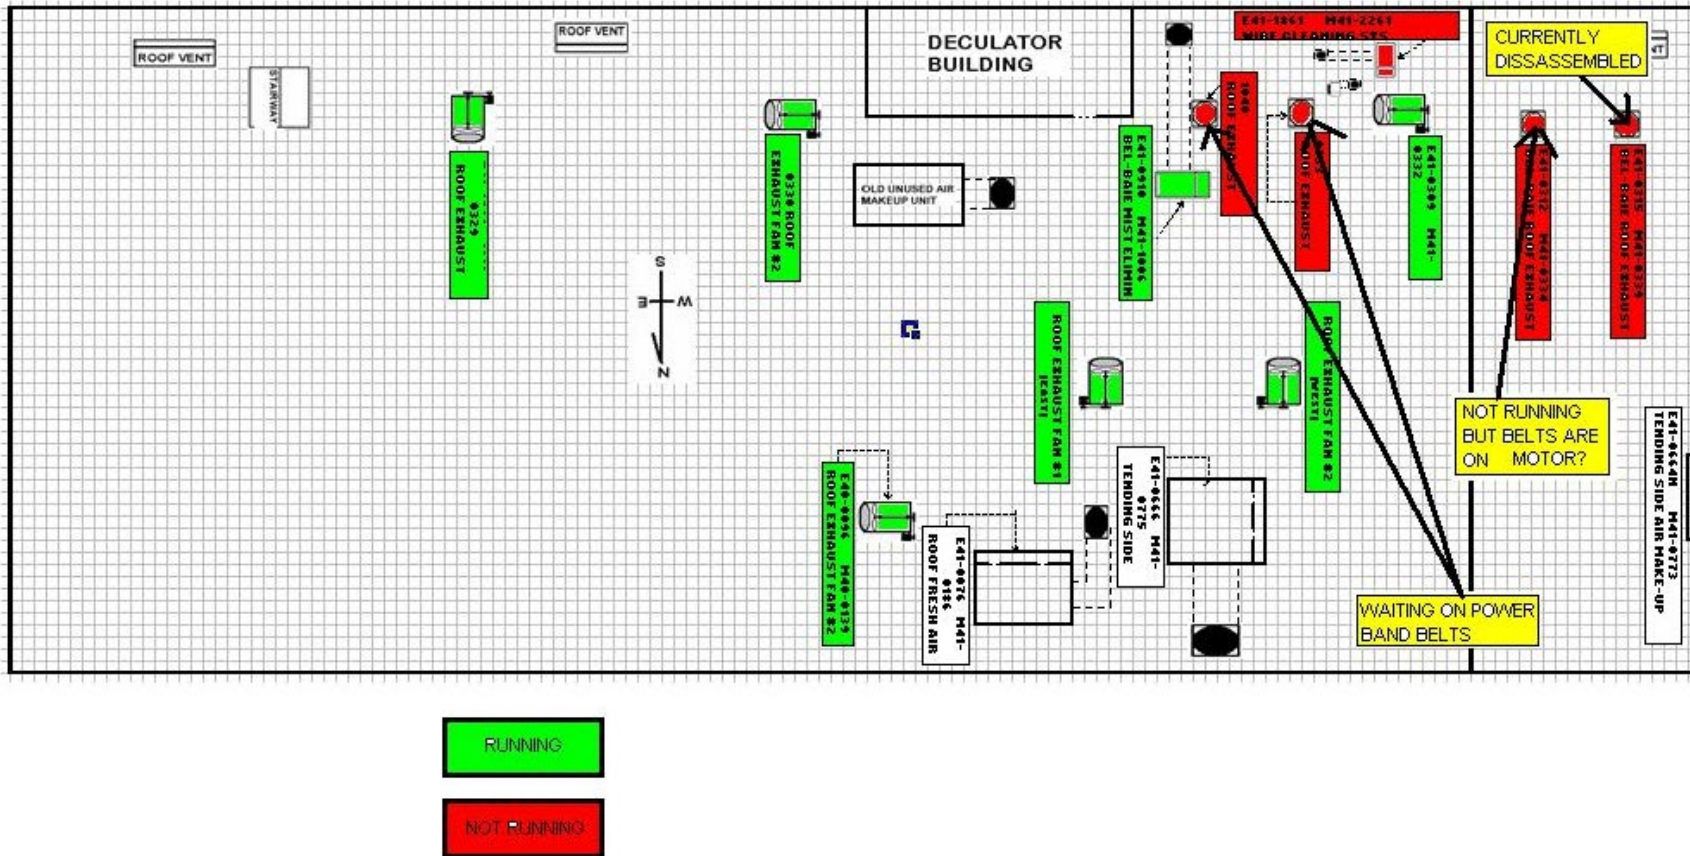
NO. 3 PAPER MACHINE ROOF TOP DRAWING
